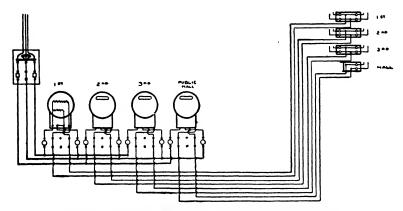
Service Wiring Diagram for 3-Story Apartment Building
